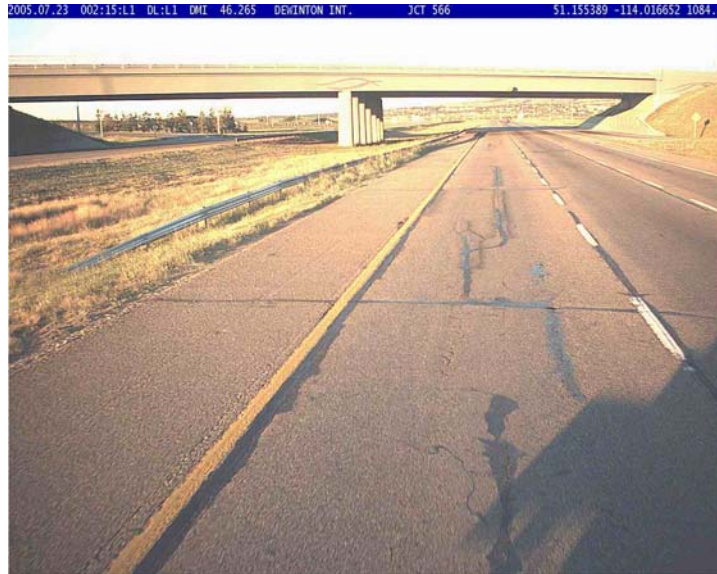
W-Beam Weak Post Barrier System at Country Hills Boulevard
